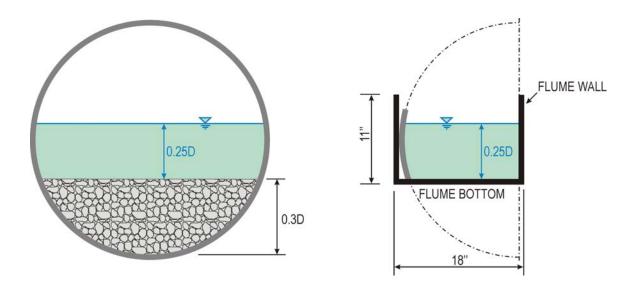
Bed Elevation at 0.30 culvert diameter and symmetrical half of Flume Culvert Model
